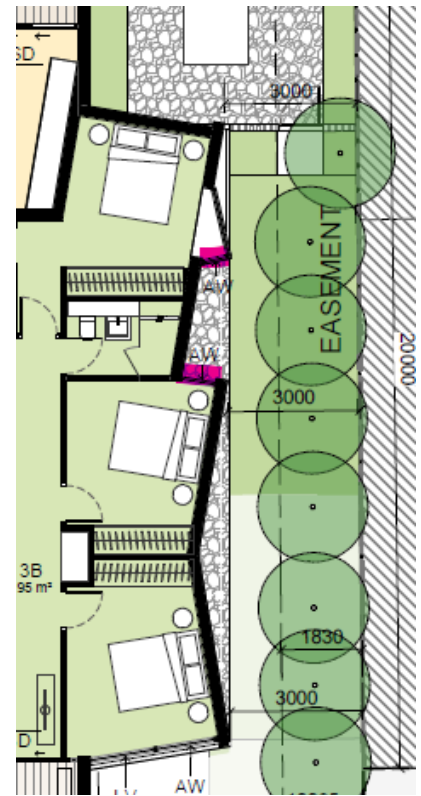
Windows associated with bedrooms where 3m side setback proposed
